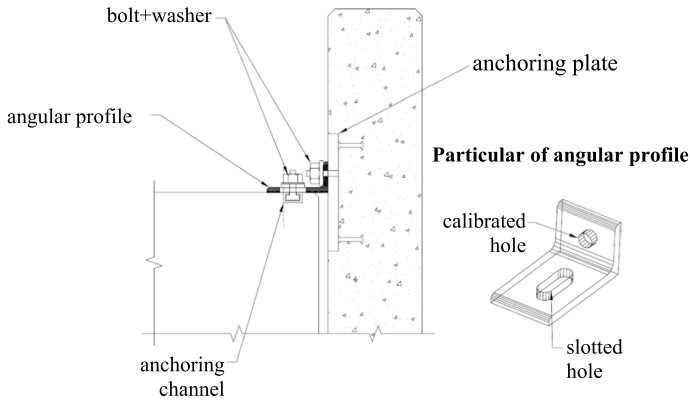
Scheme of a typical connection for vertical cladding panels, adapted from Reluis Report (2007)
